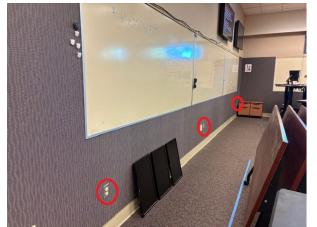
East Wall Detail. The lower outlets on this wall are marked by red circles and are at standard 16" height.
